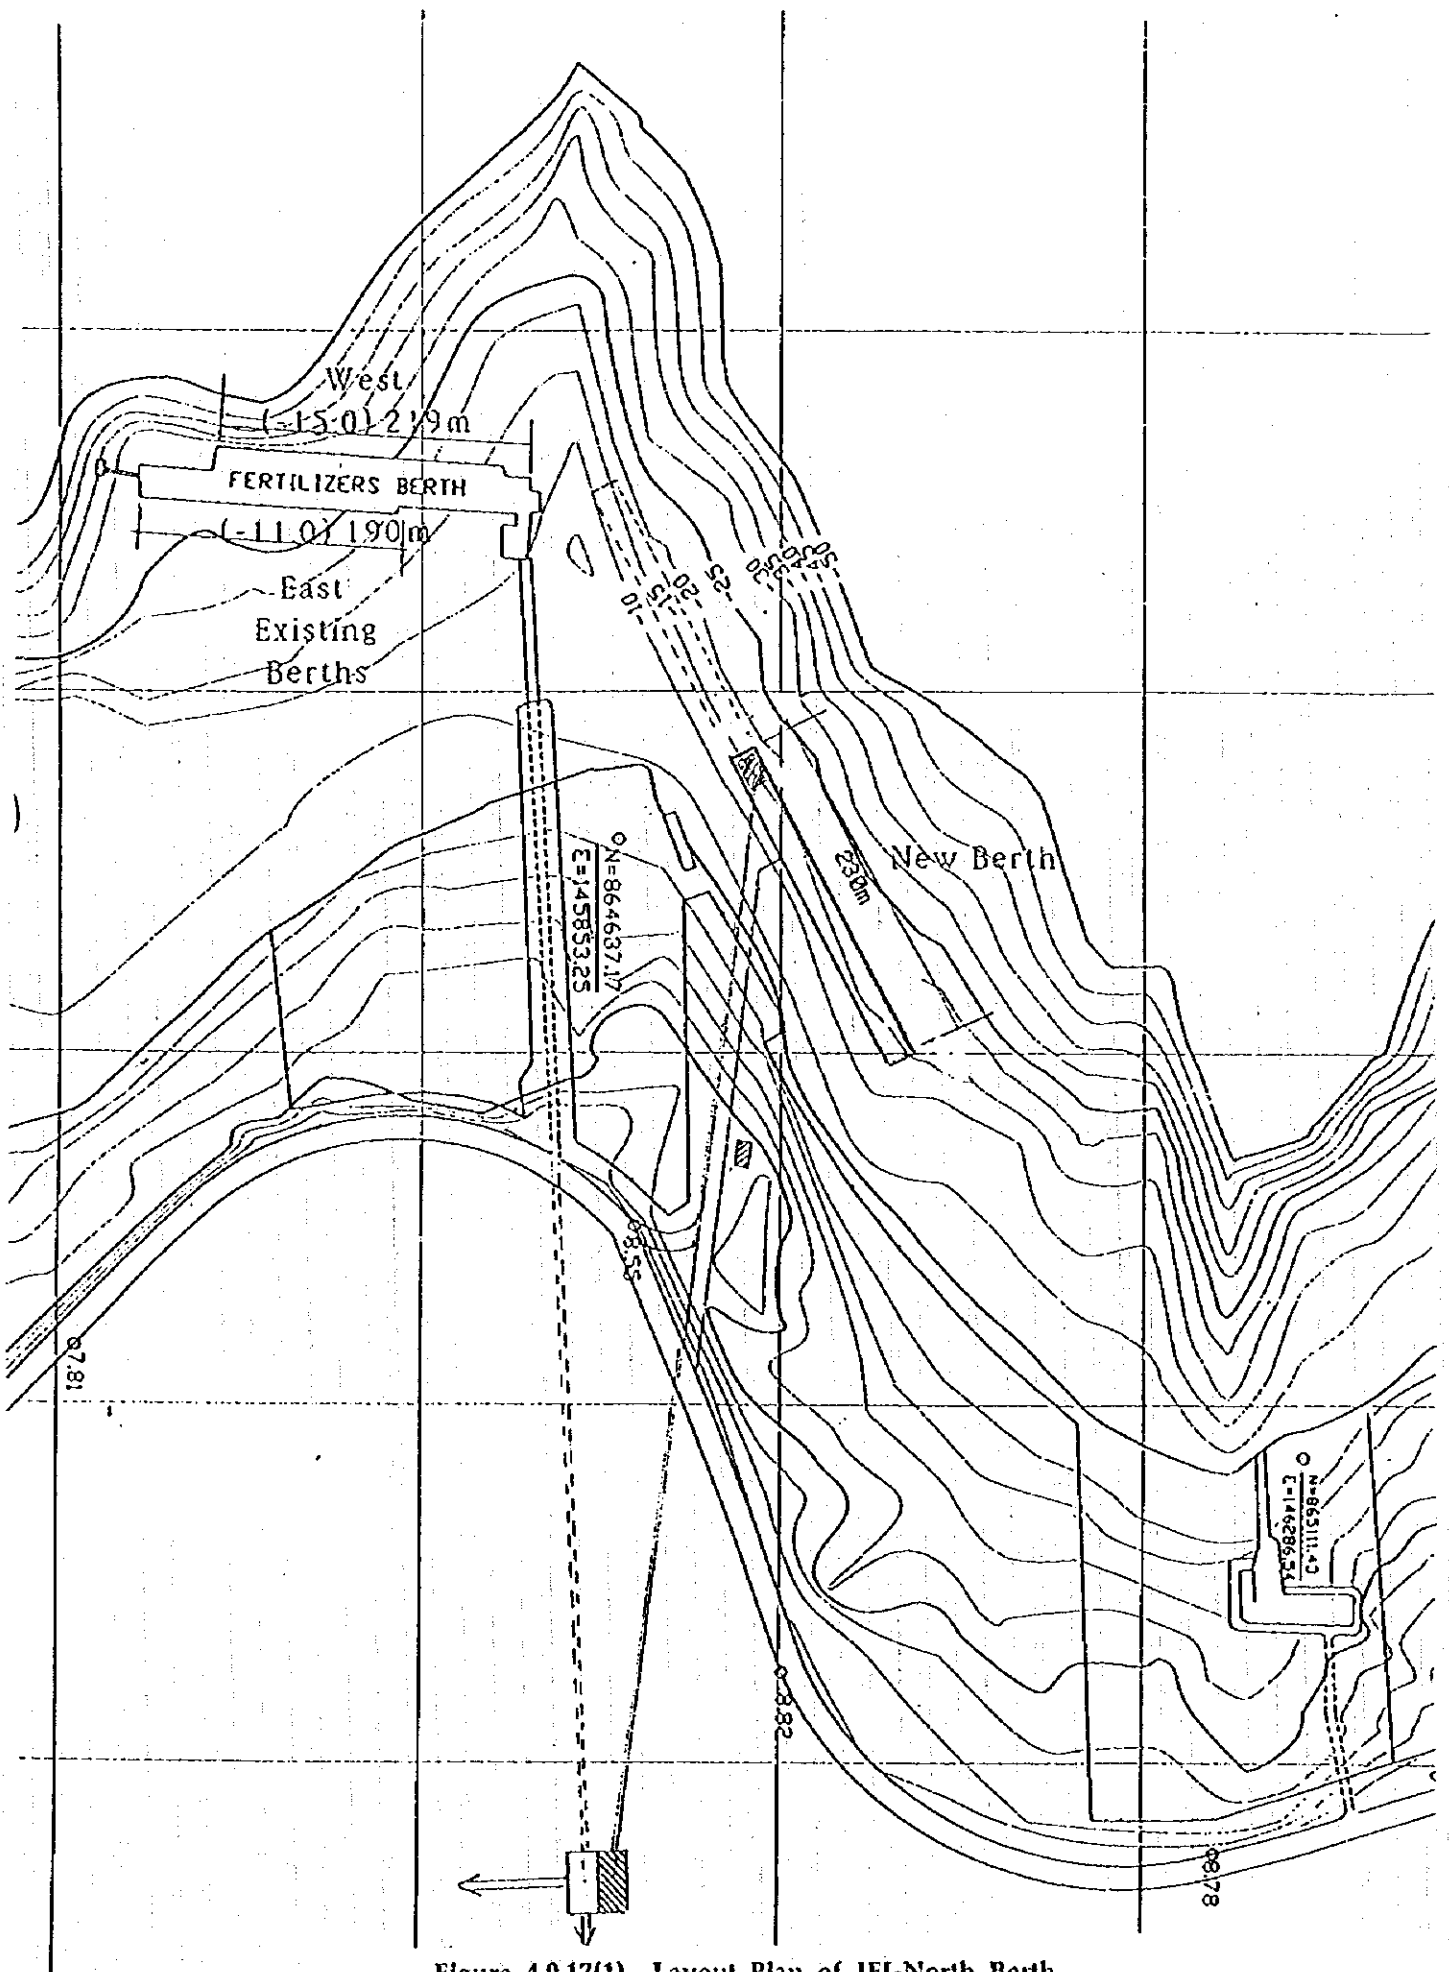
(1) Layout Plan of JFI-North Berth
